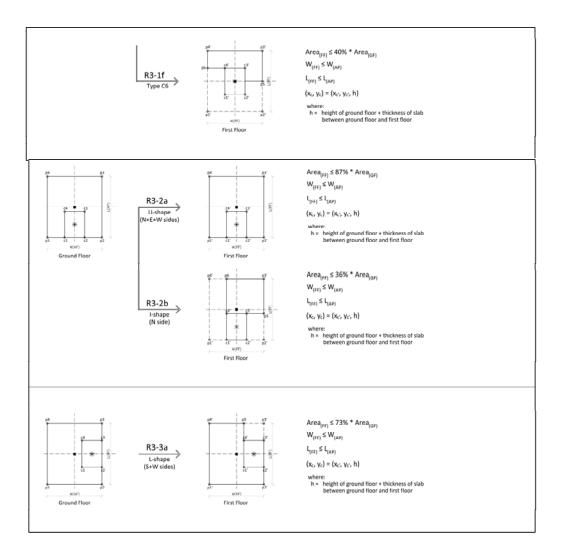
Sets of parametric rules for generating the schematic layout of the ground/first floors in two-floor houses (part 2)
